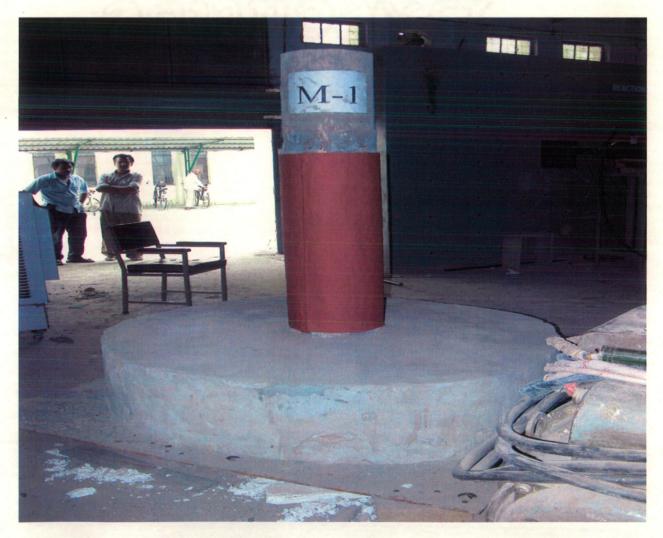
Model M1 after Retrofitting with steel jacketing
